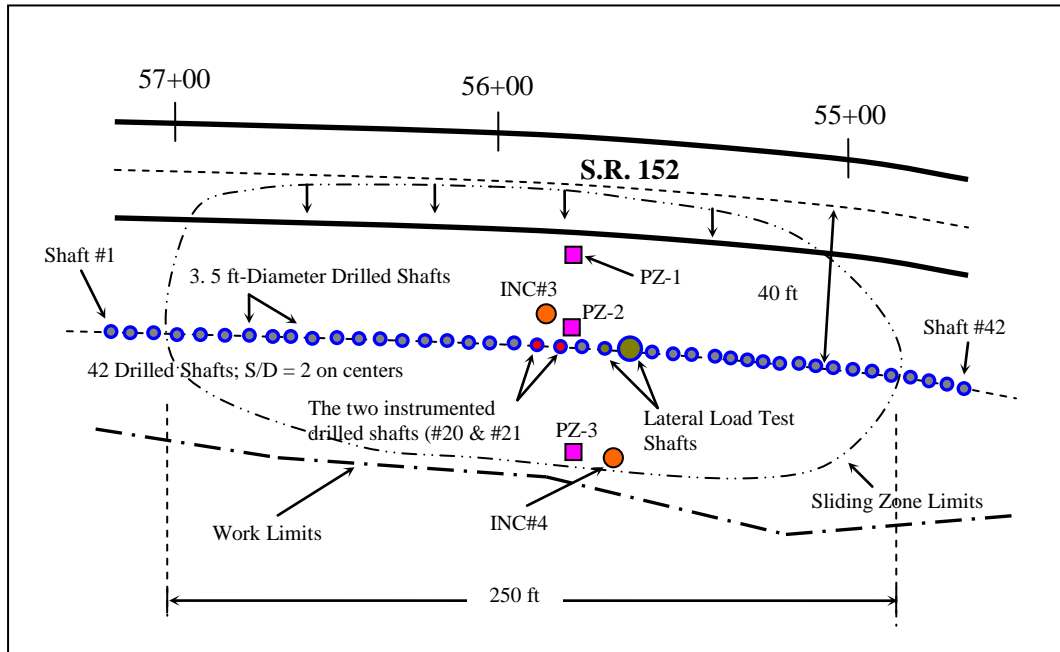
Plan View of the Instrumentation Details at JEF-152 Landslide Site
